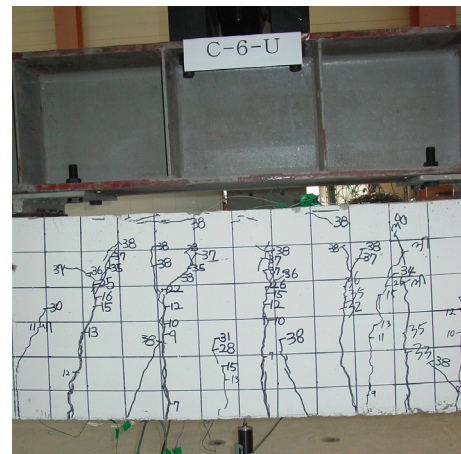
Tension and Compression Cracks of Concrete (U Beam)
